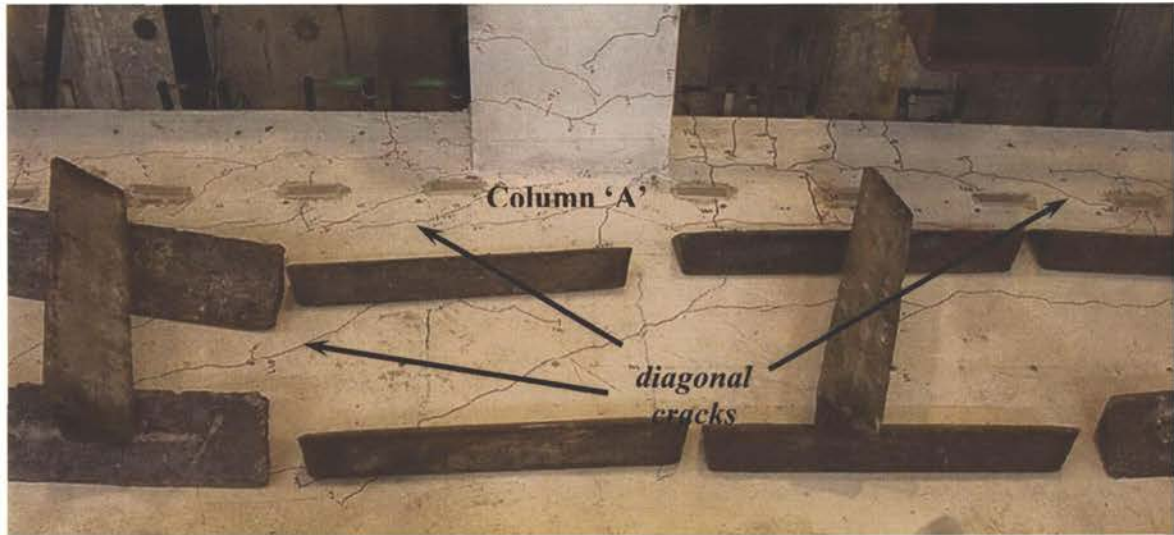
Diagonal cracking on floor in vicinity of column 'A', at 1.0% drift.
